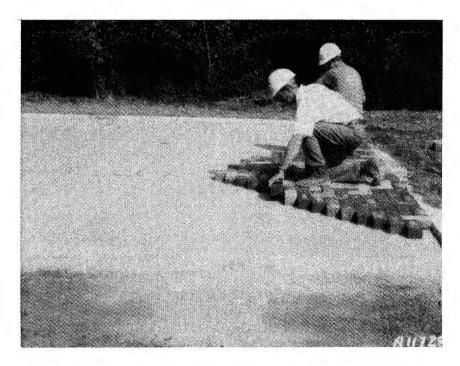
Concrete paving blocks being placed by hand at Aberdeen Proving Ground (from Anderton 1991a)
